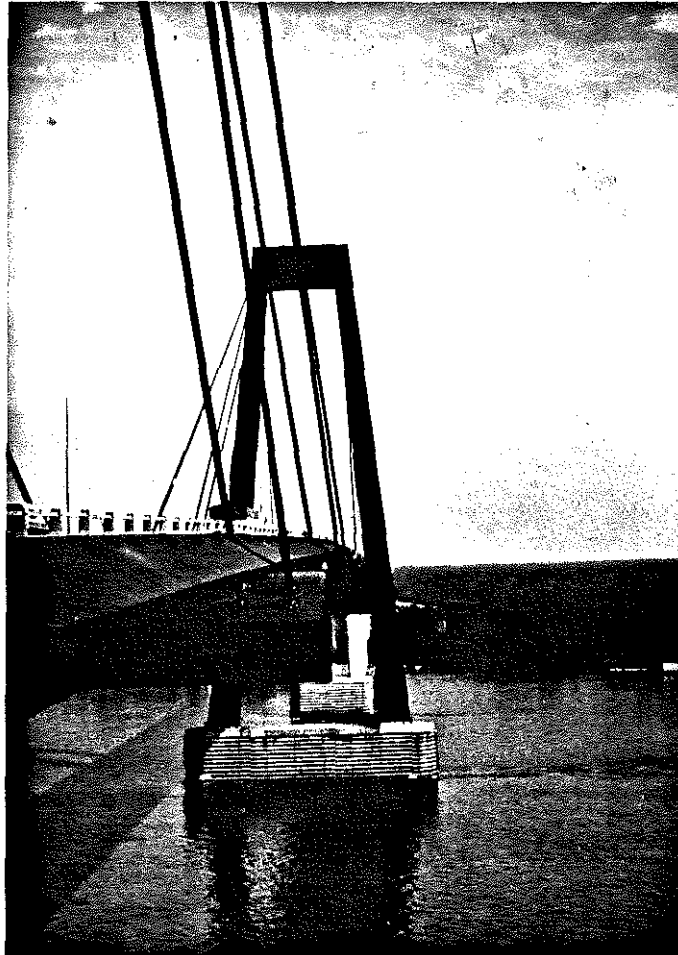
Cross Girder Detail on the I-310 Cable-Stayed Bridge at Luling, LA.
